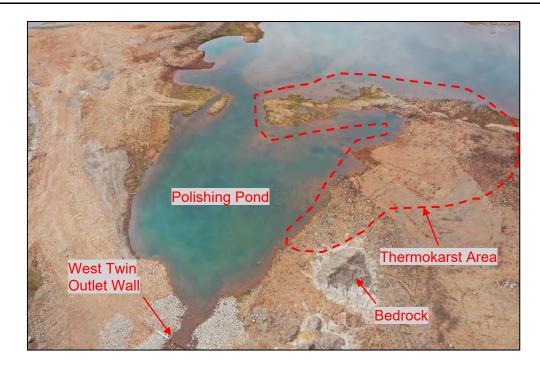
Polishing Pond – Thermokarsting around Polishing Pond, as seen from UAV.
